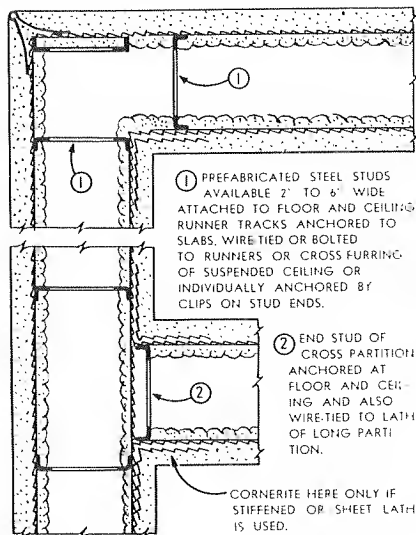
Diagram Showing Typical Arrangement of Metal Studs at Wall Corners and Partition Intersections.
